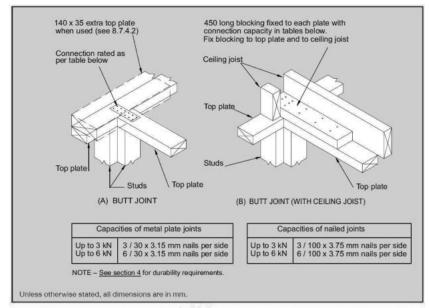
Connecting top plates to external walls at right angles - Walls containing bracing (see 8.7.3.4)
